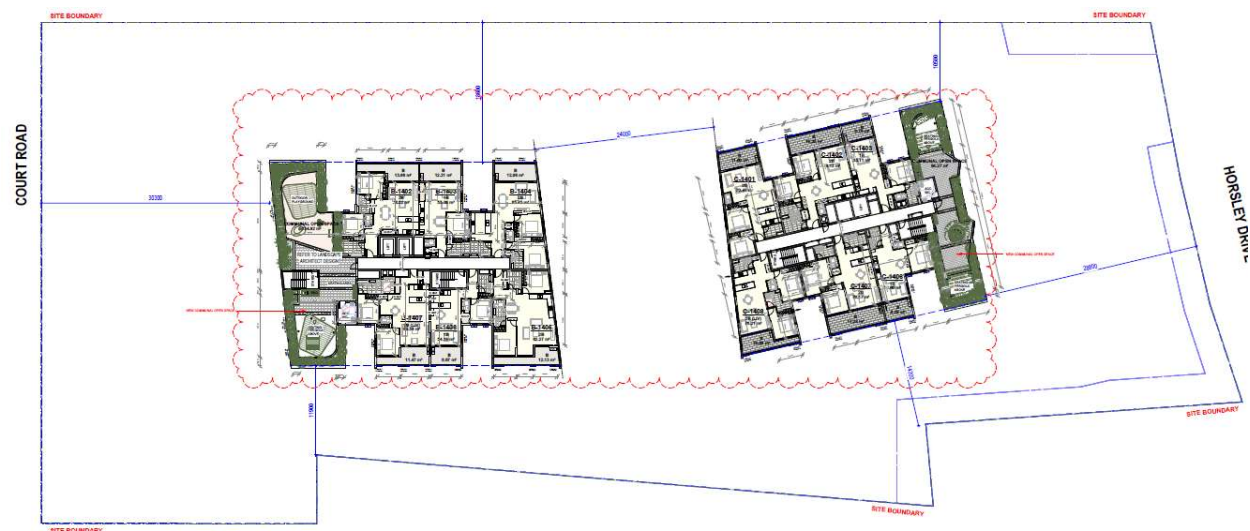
Proposed Level 14 plan proposing additional storey to Buildings B and C.
